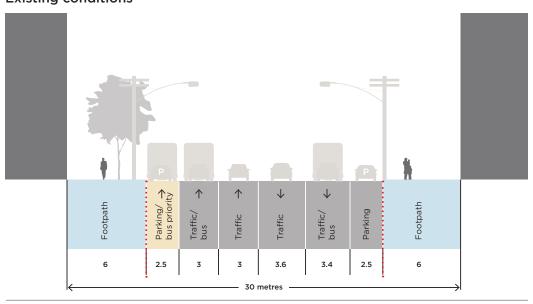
Existing conditions of City Road looking east towards Queens Bridge Street (Section A)
